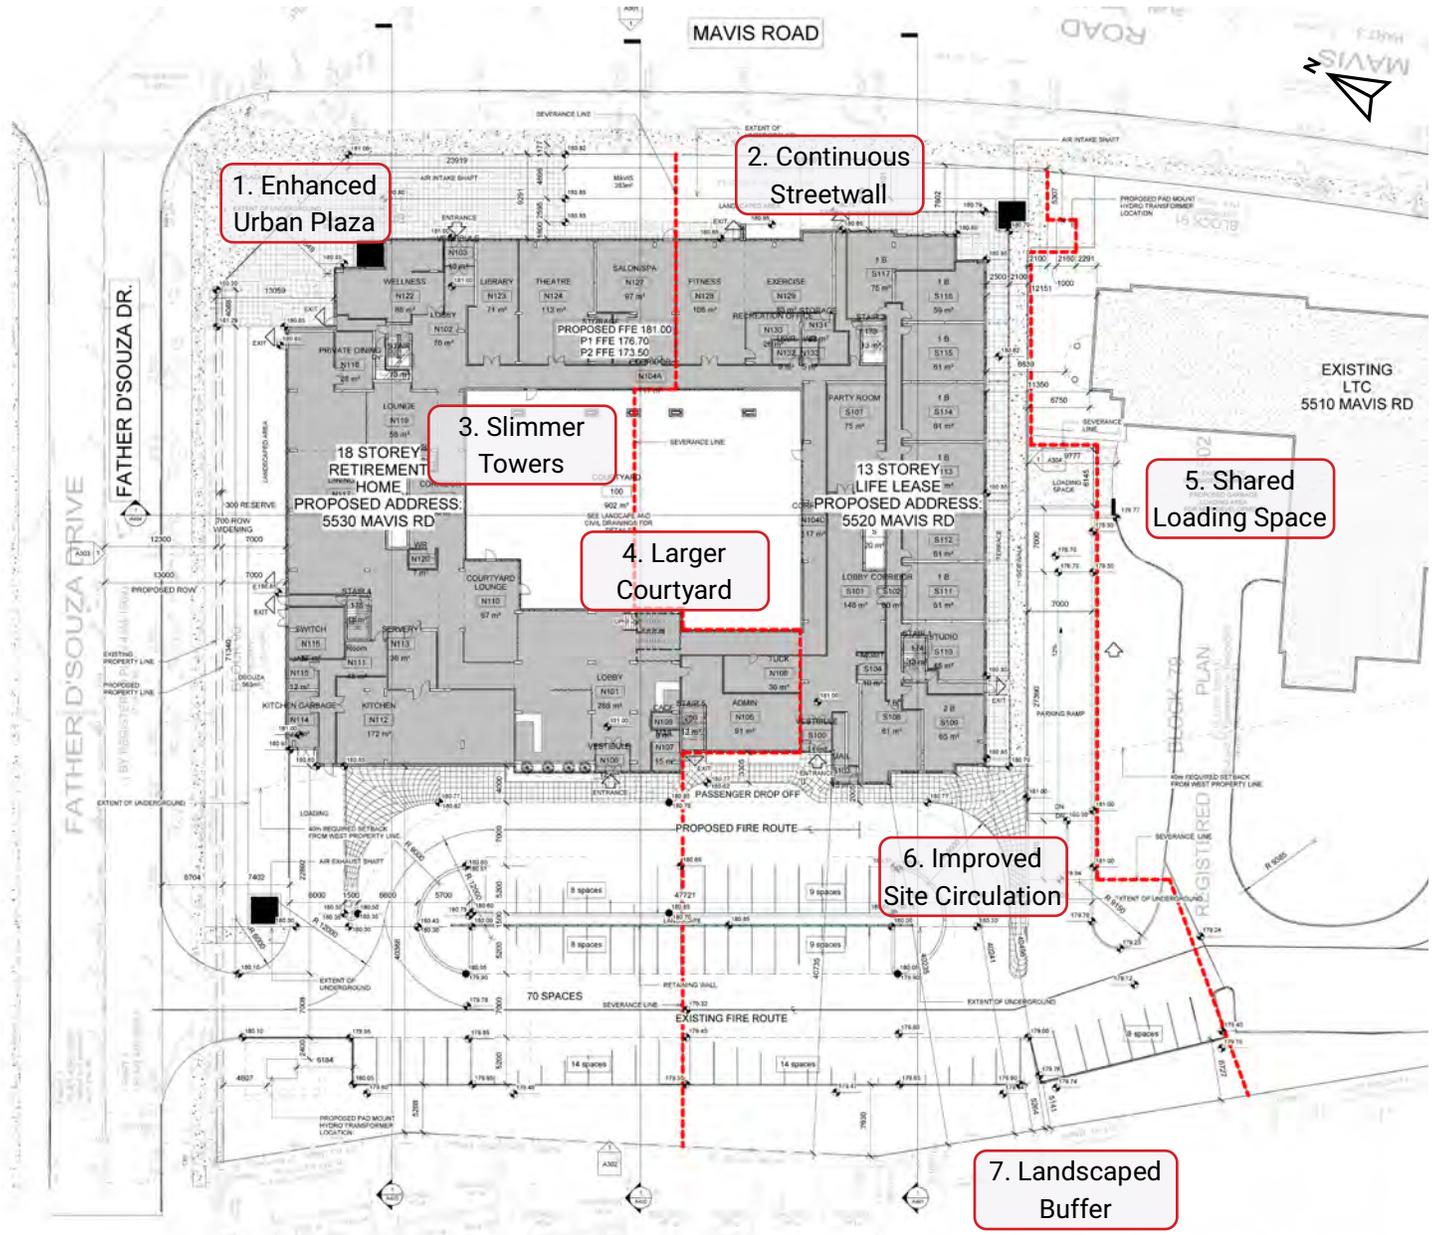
ARCHITECTURAL DRAWINGS (SITE PLAN) OF PROPOSED DEVELOPMENT FOR ZONING BY-LAW AMENDMENT
